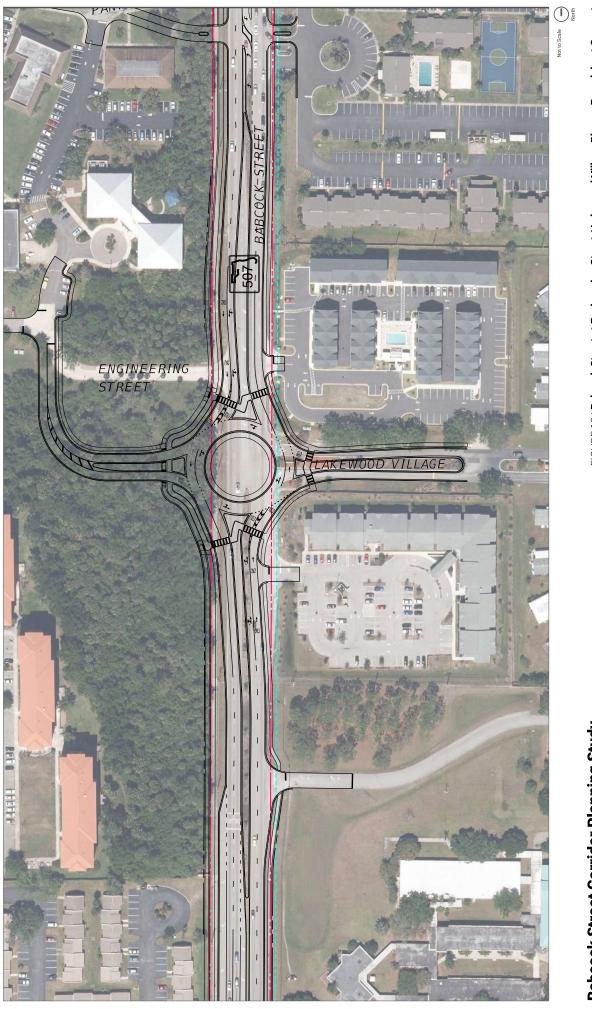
| Babcock Street at Engineering Street / Lakewood Village Place - Roundabout Concept
